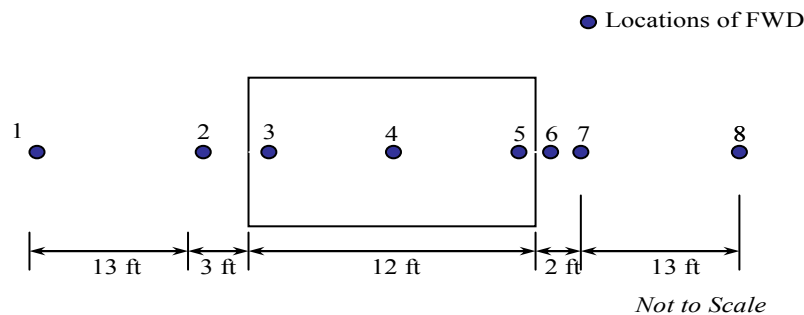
Locations of FWD testing points for Cedar Rapids trench
